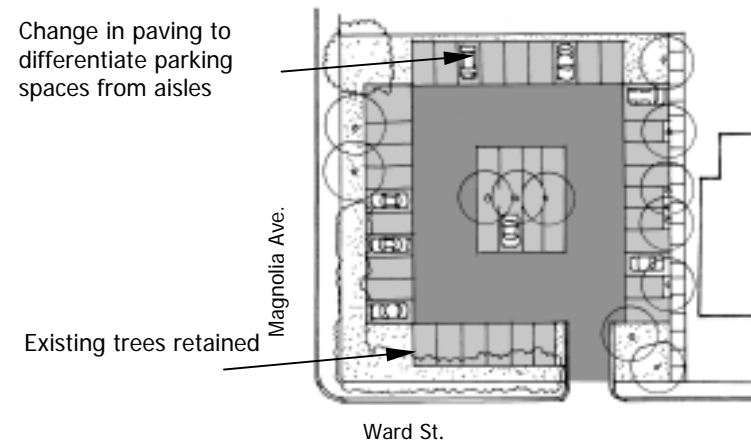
Illustrative Only -- Plan of Library on City Parking Lot with 29 spaces.
